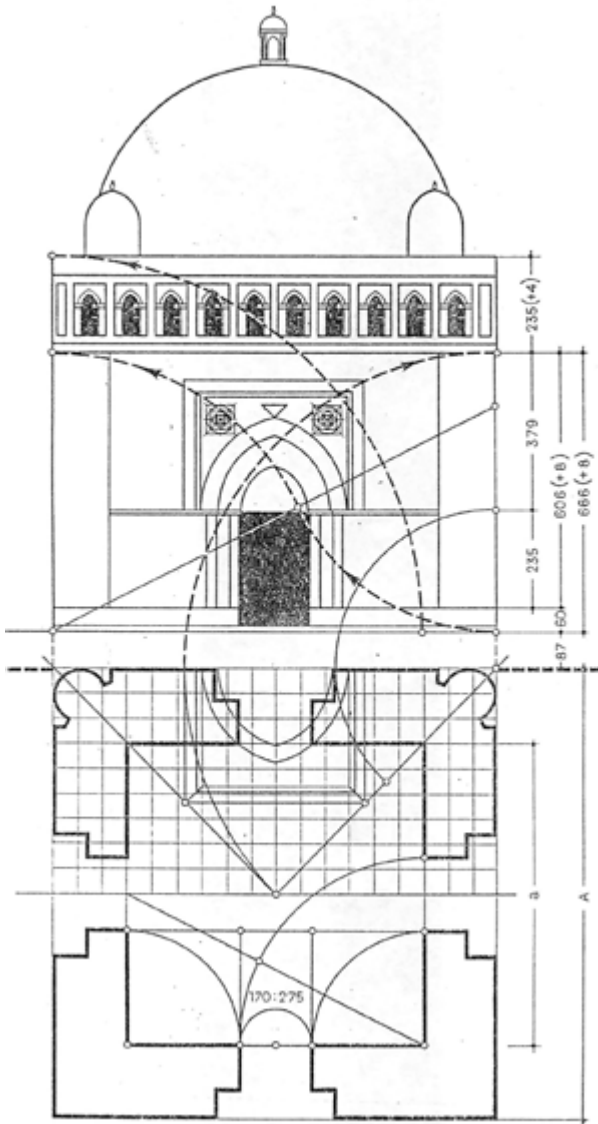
Tomb of Ismail Samani, Bukhara, 907 AD. Elevation and plan (Bulatov 1988)
